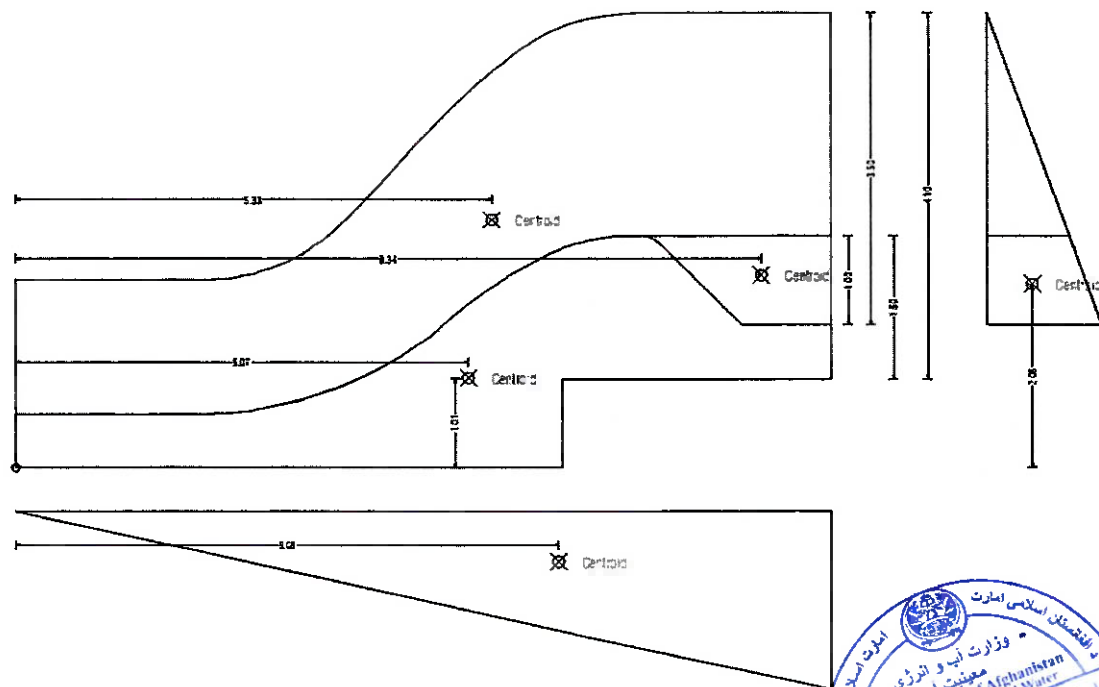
Geometry of Section and Loads with its centroids and lever arms
